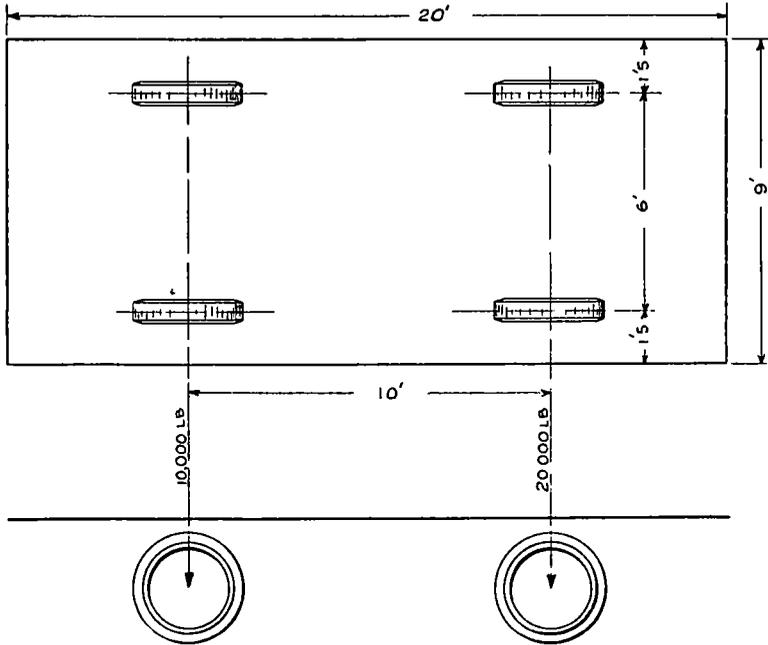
15-Ton Truck Loading, B P R Specifications, 1919
